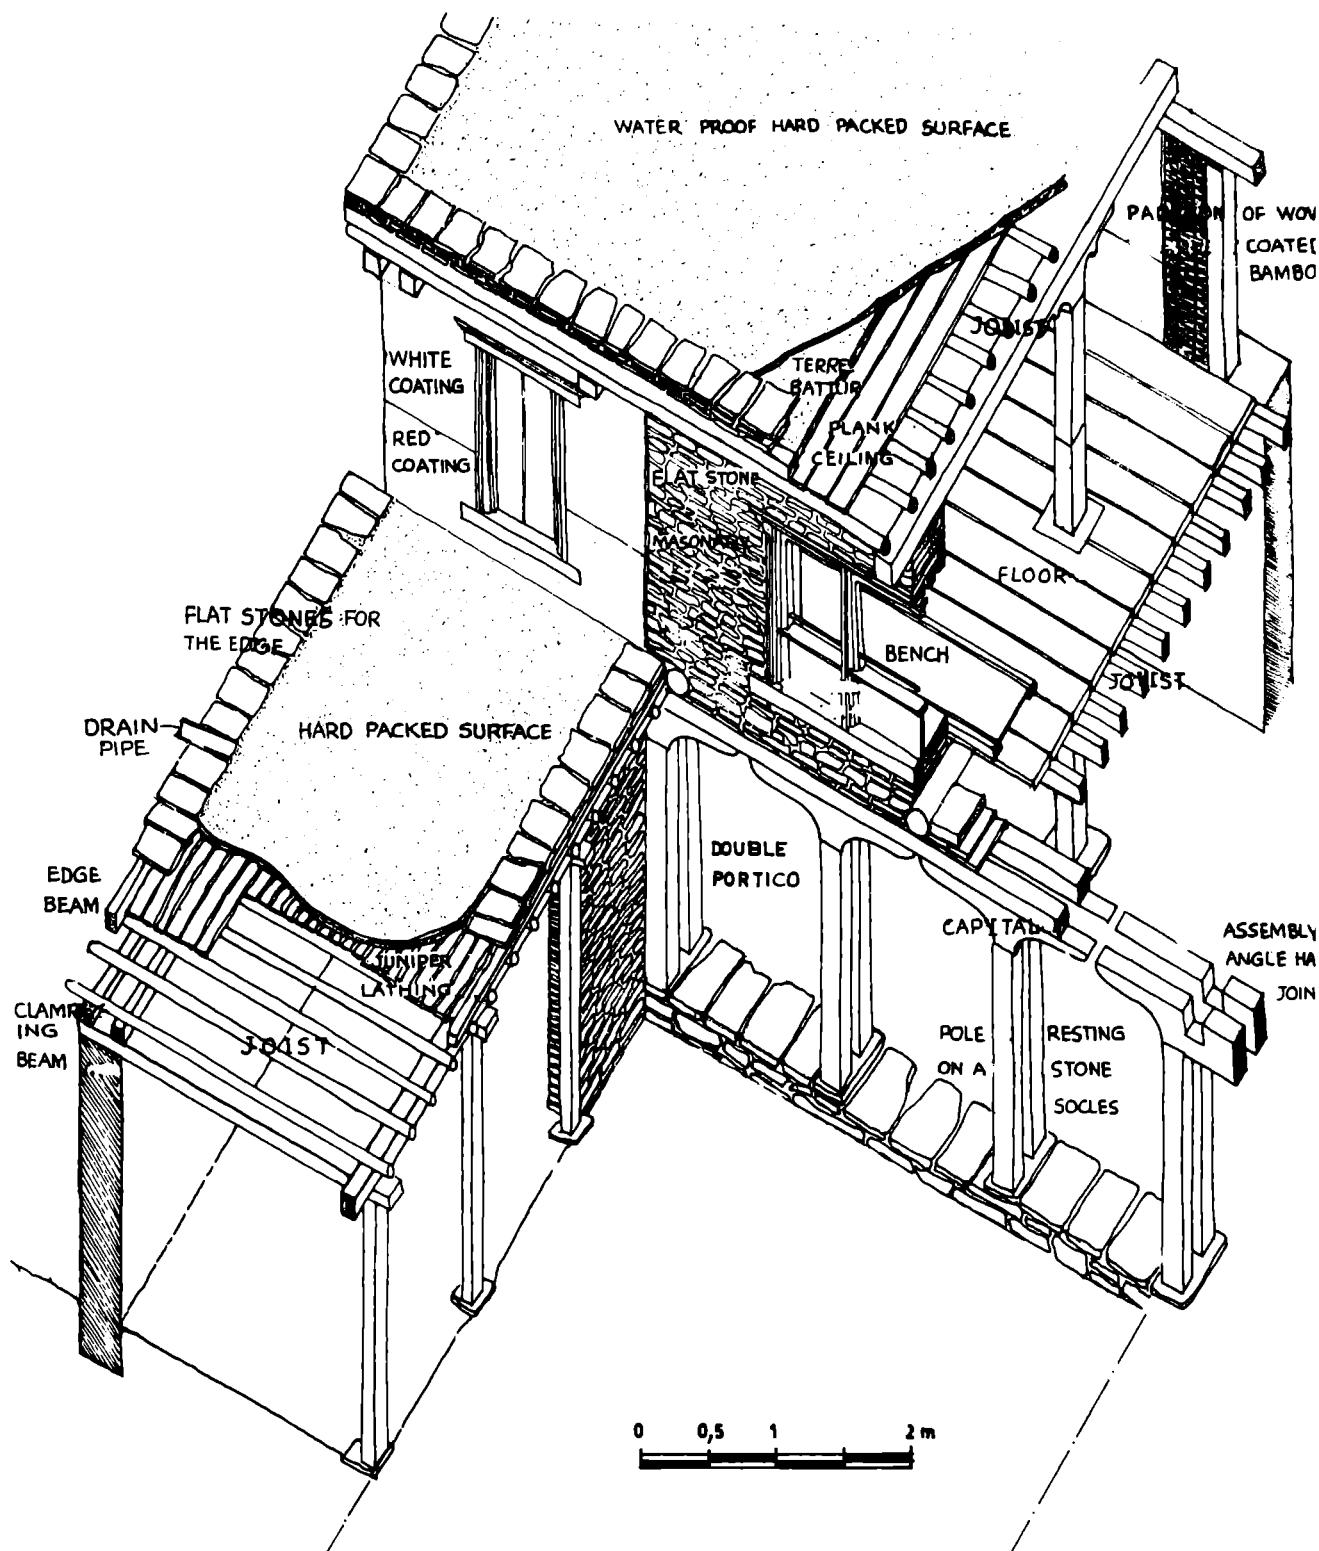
Axonometric projection showing the building structure of the Thak Khola house
